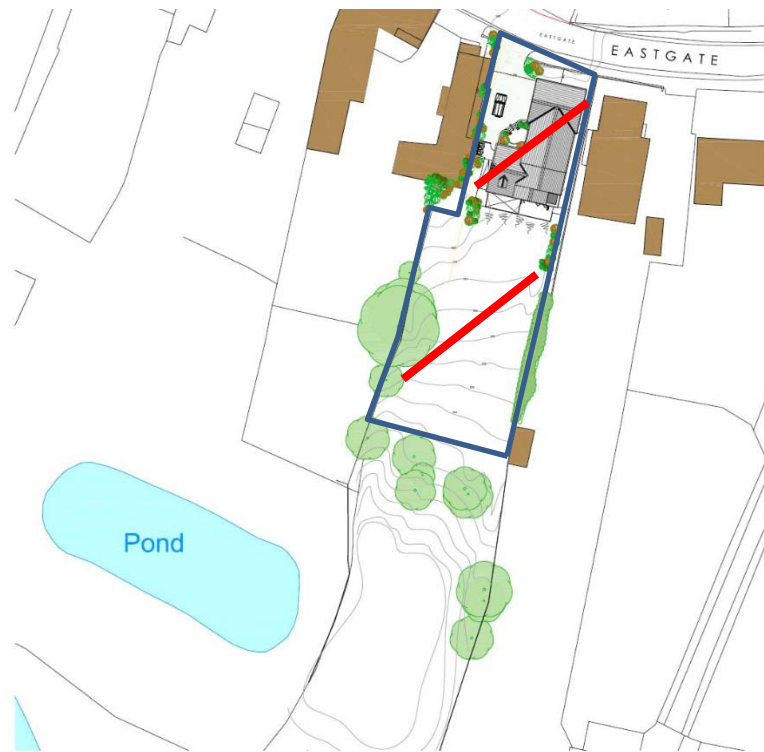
Plan of the proposed development (provided by client) with proposed trench locations
